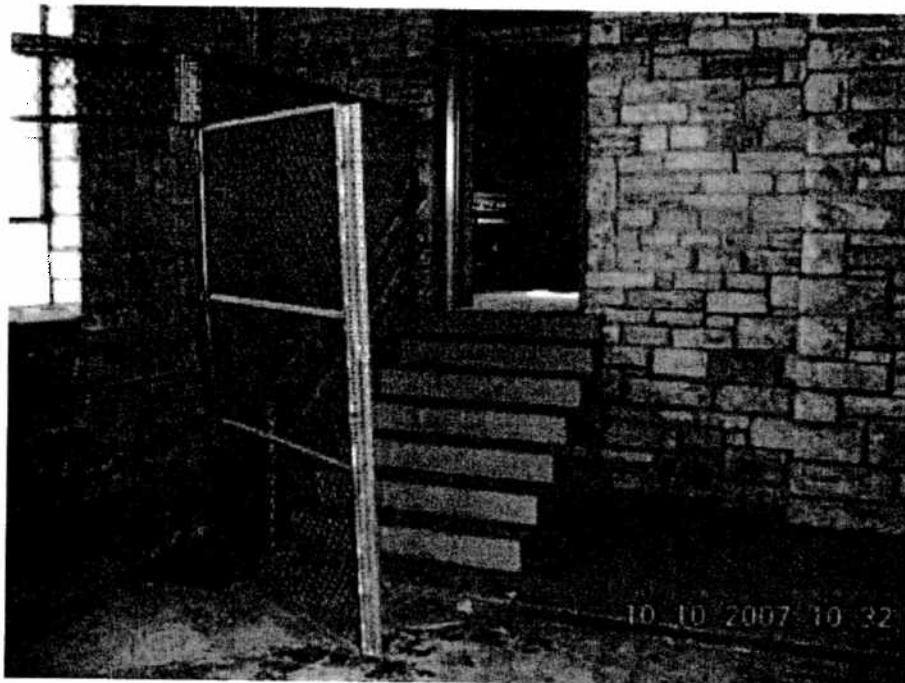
Yellow stairs leading to the kitchen on the northeast side of the drill floor. Note caged stairwell leading to the basement IFR to the left.
